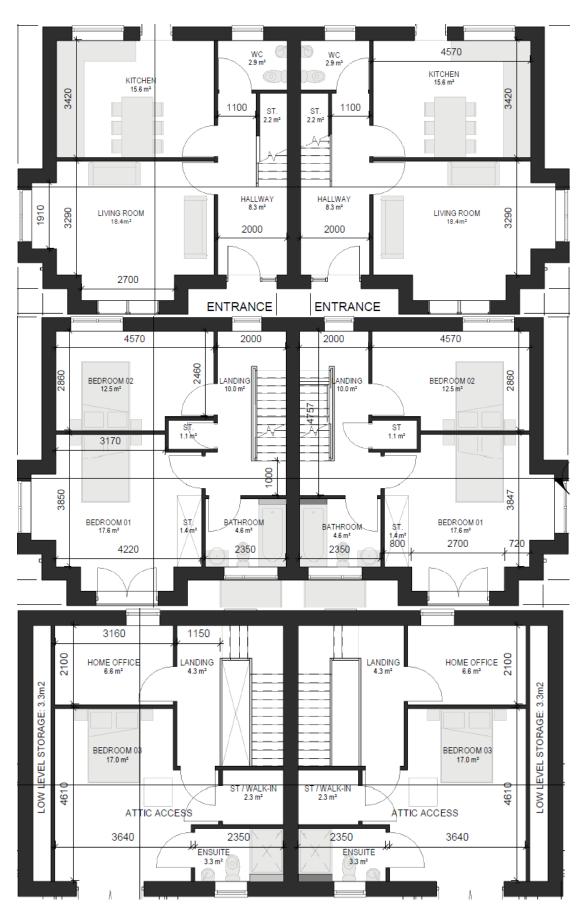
Typical ground floor plan of House Types 6.4-6.5 (top), typical first floor plan of House Types 6.4-6.5 (centre) and typical second floor plan of House Type 6.4-6.5 (bottom).
